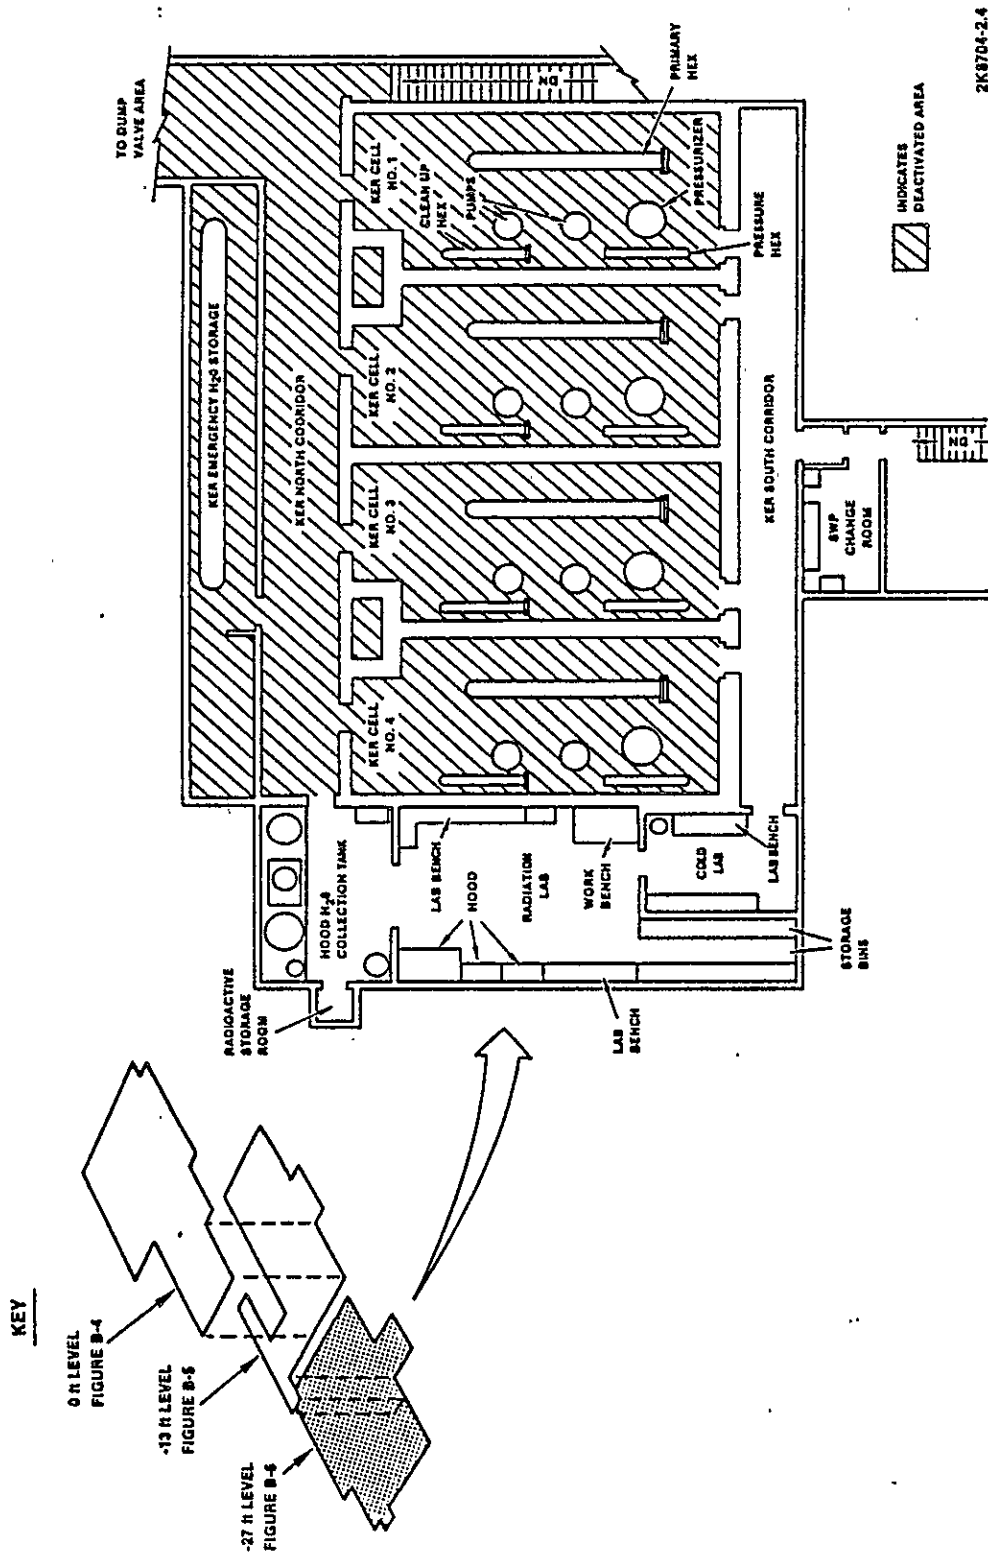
General Layout 1706-KE Building - 21-ft Level.
